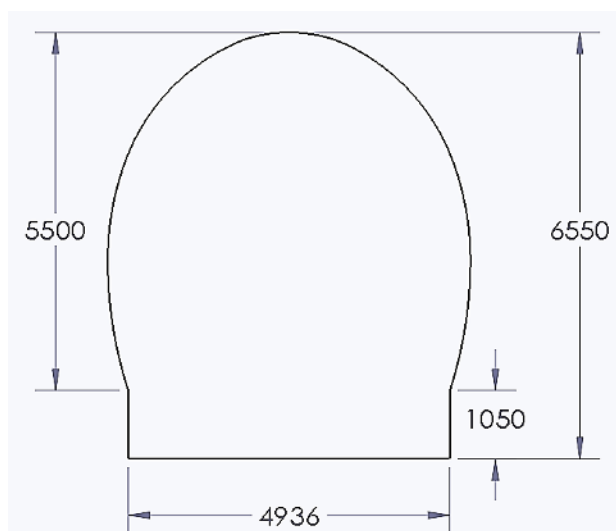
Cross-section of the tunnel (Dimensions are in millimeters)
